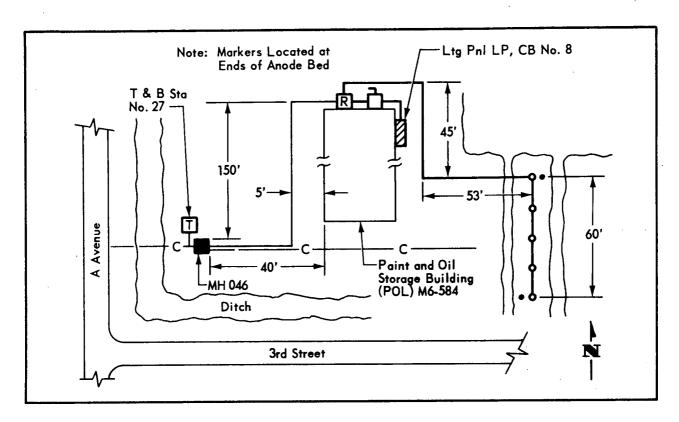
Site No. 32 and Test and Bond Station No. 27 Equipment Locator
